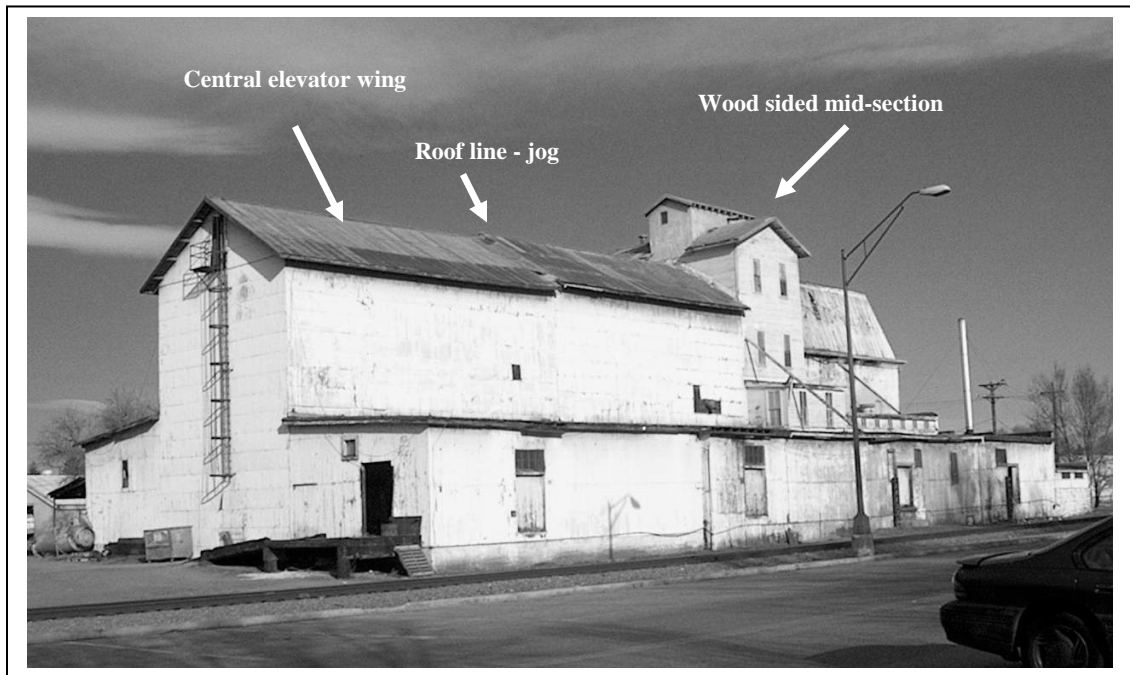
Sheet metal clad gable portion of building, which houses twenty (20) grain bins.
